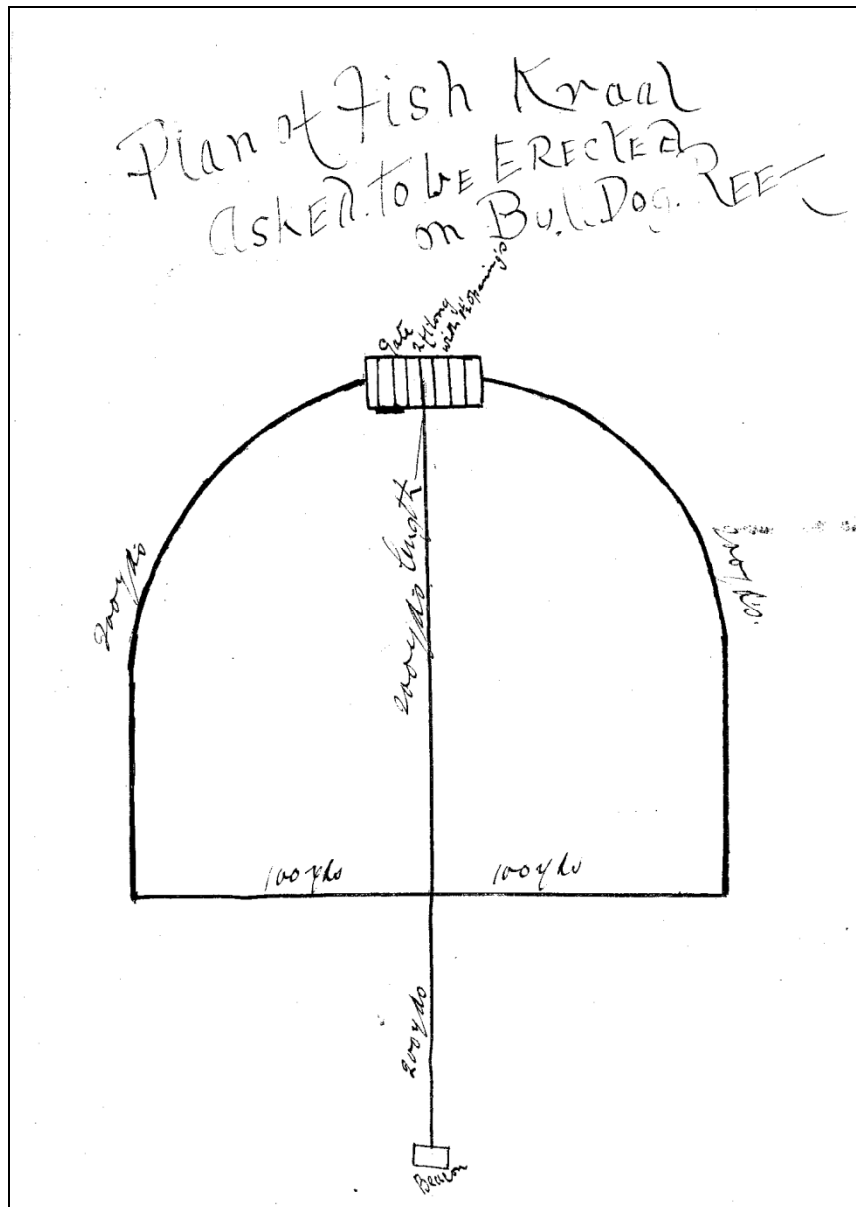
Sketch plan of Fish trap of Jan Newman at the beacon of Struis bay. Cape Archives. PAN 55. K13/10.
